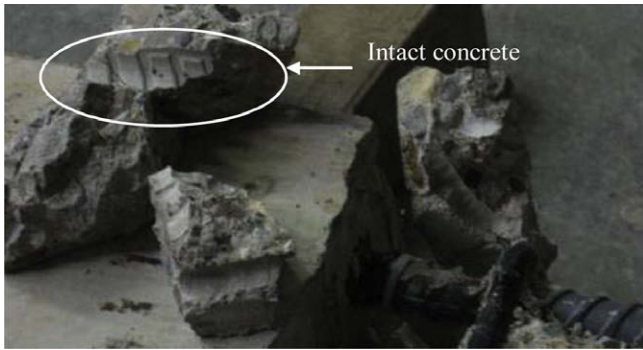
Intact concrete taken from the anchorage zone from below the steel bar.
